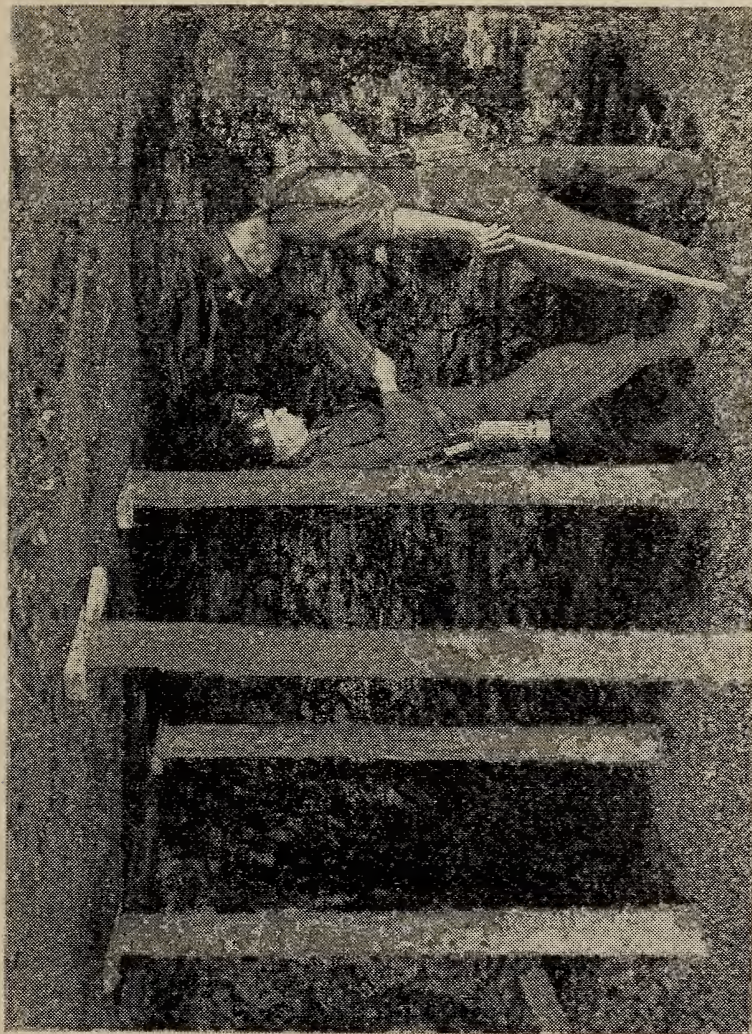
A definite timbering plan should be adopted; miners should be made thoroughly familiar with it and should follow it carefully.
